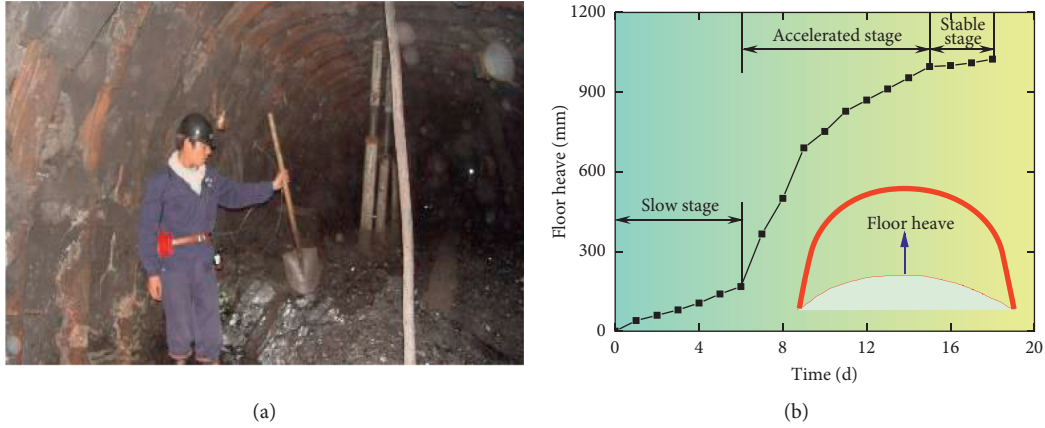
Roadway floor heave. (a) Floor heave; (b) floor deformation.
